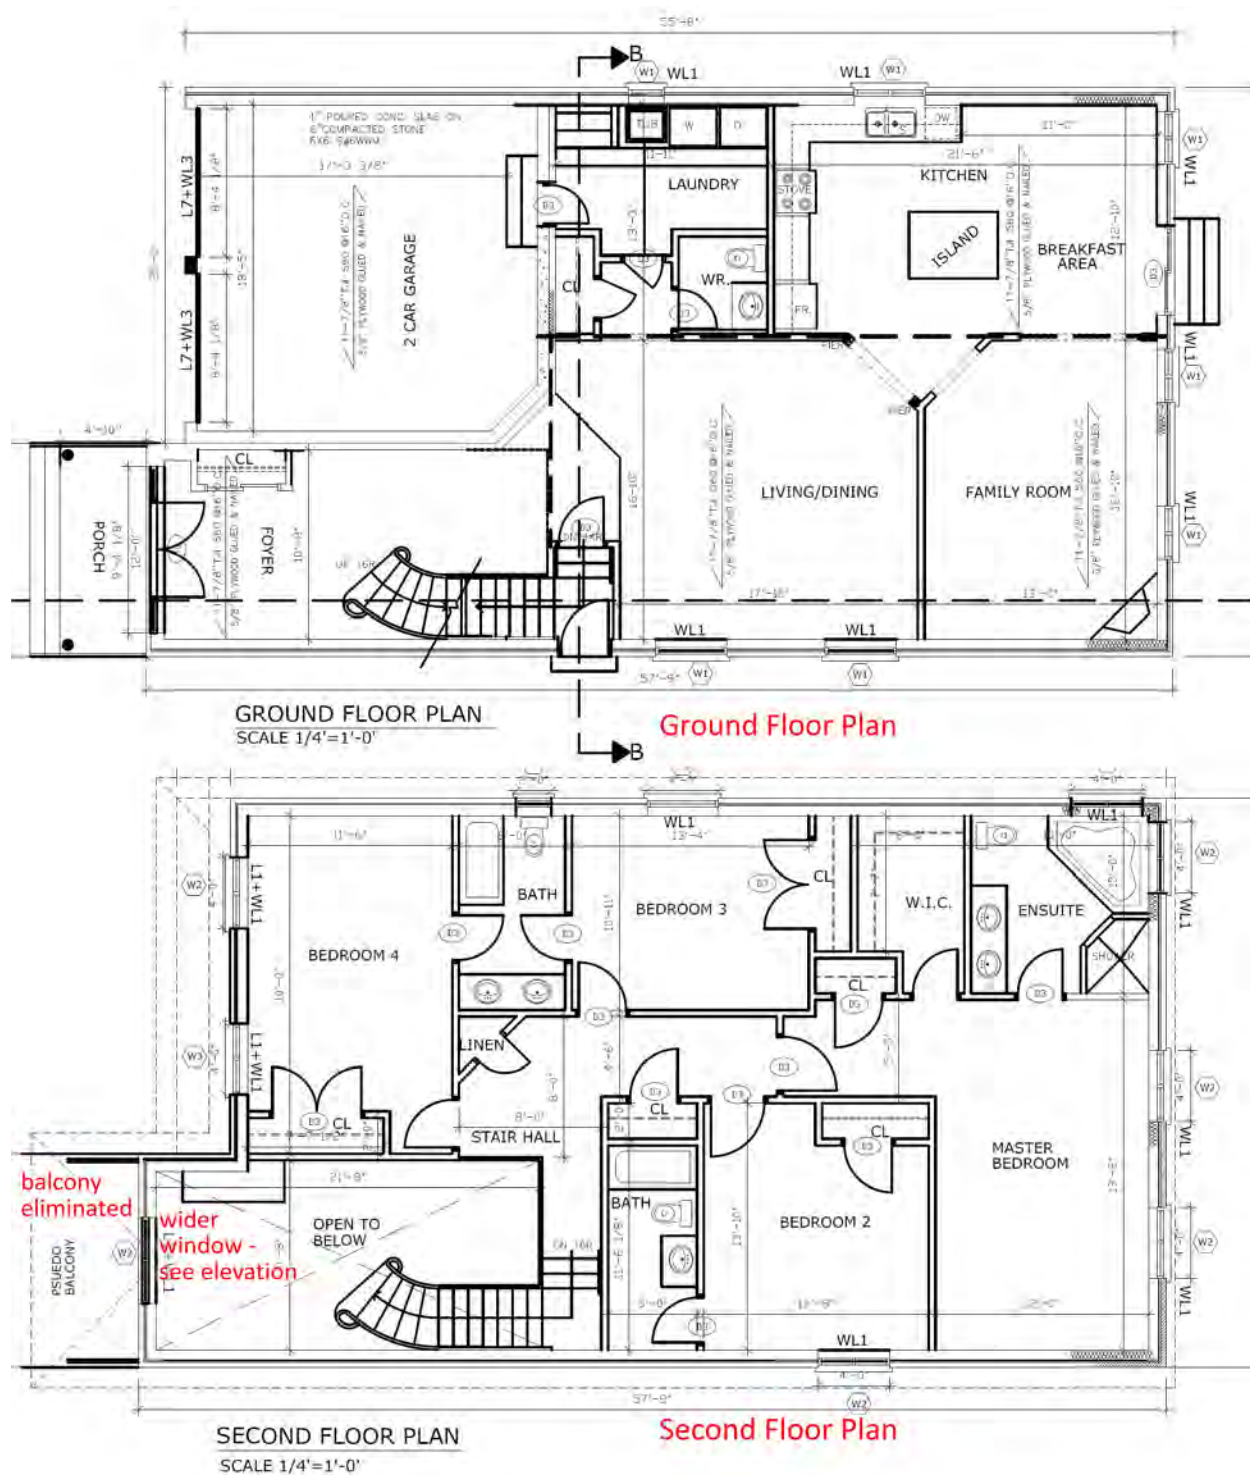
First and second floor plans of the proposed new residence: *not* revised to show changes resulting from the elimination of the false balcony.
